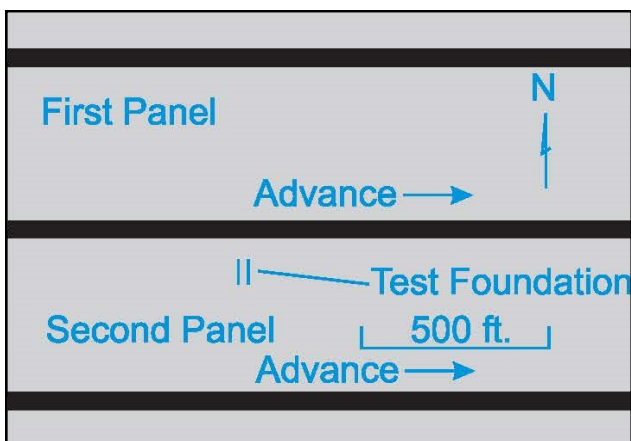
LOCATION OF TEST FOUNDATION OVER LONGWALL PANELS IN FRANKFORT, IL
